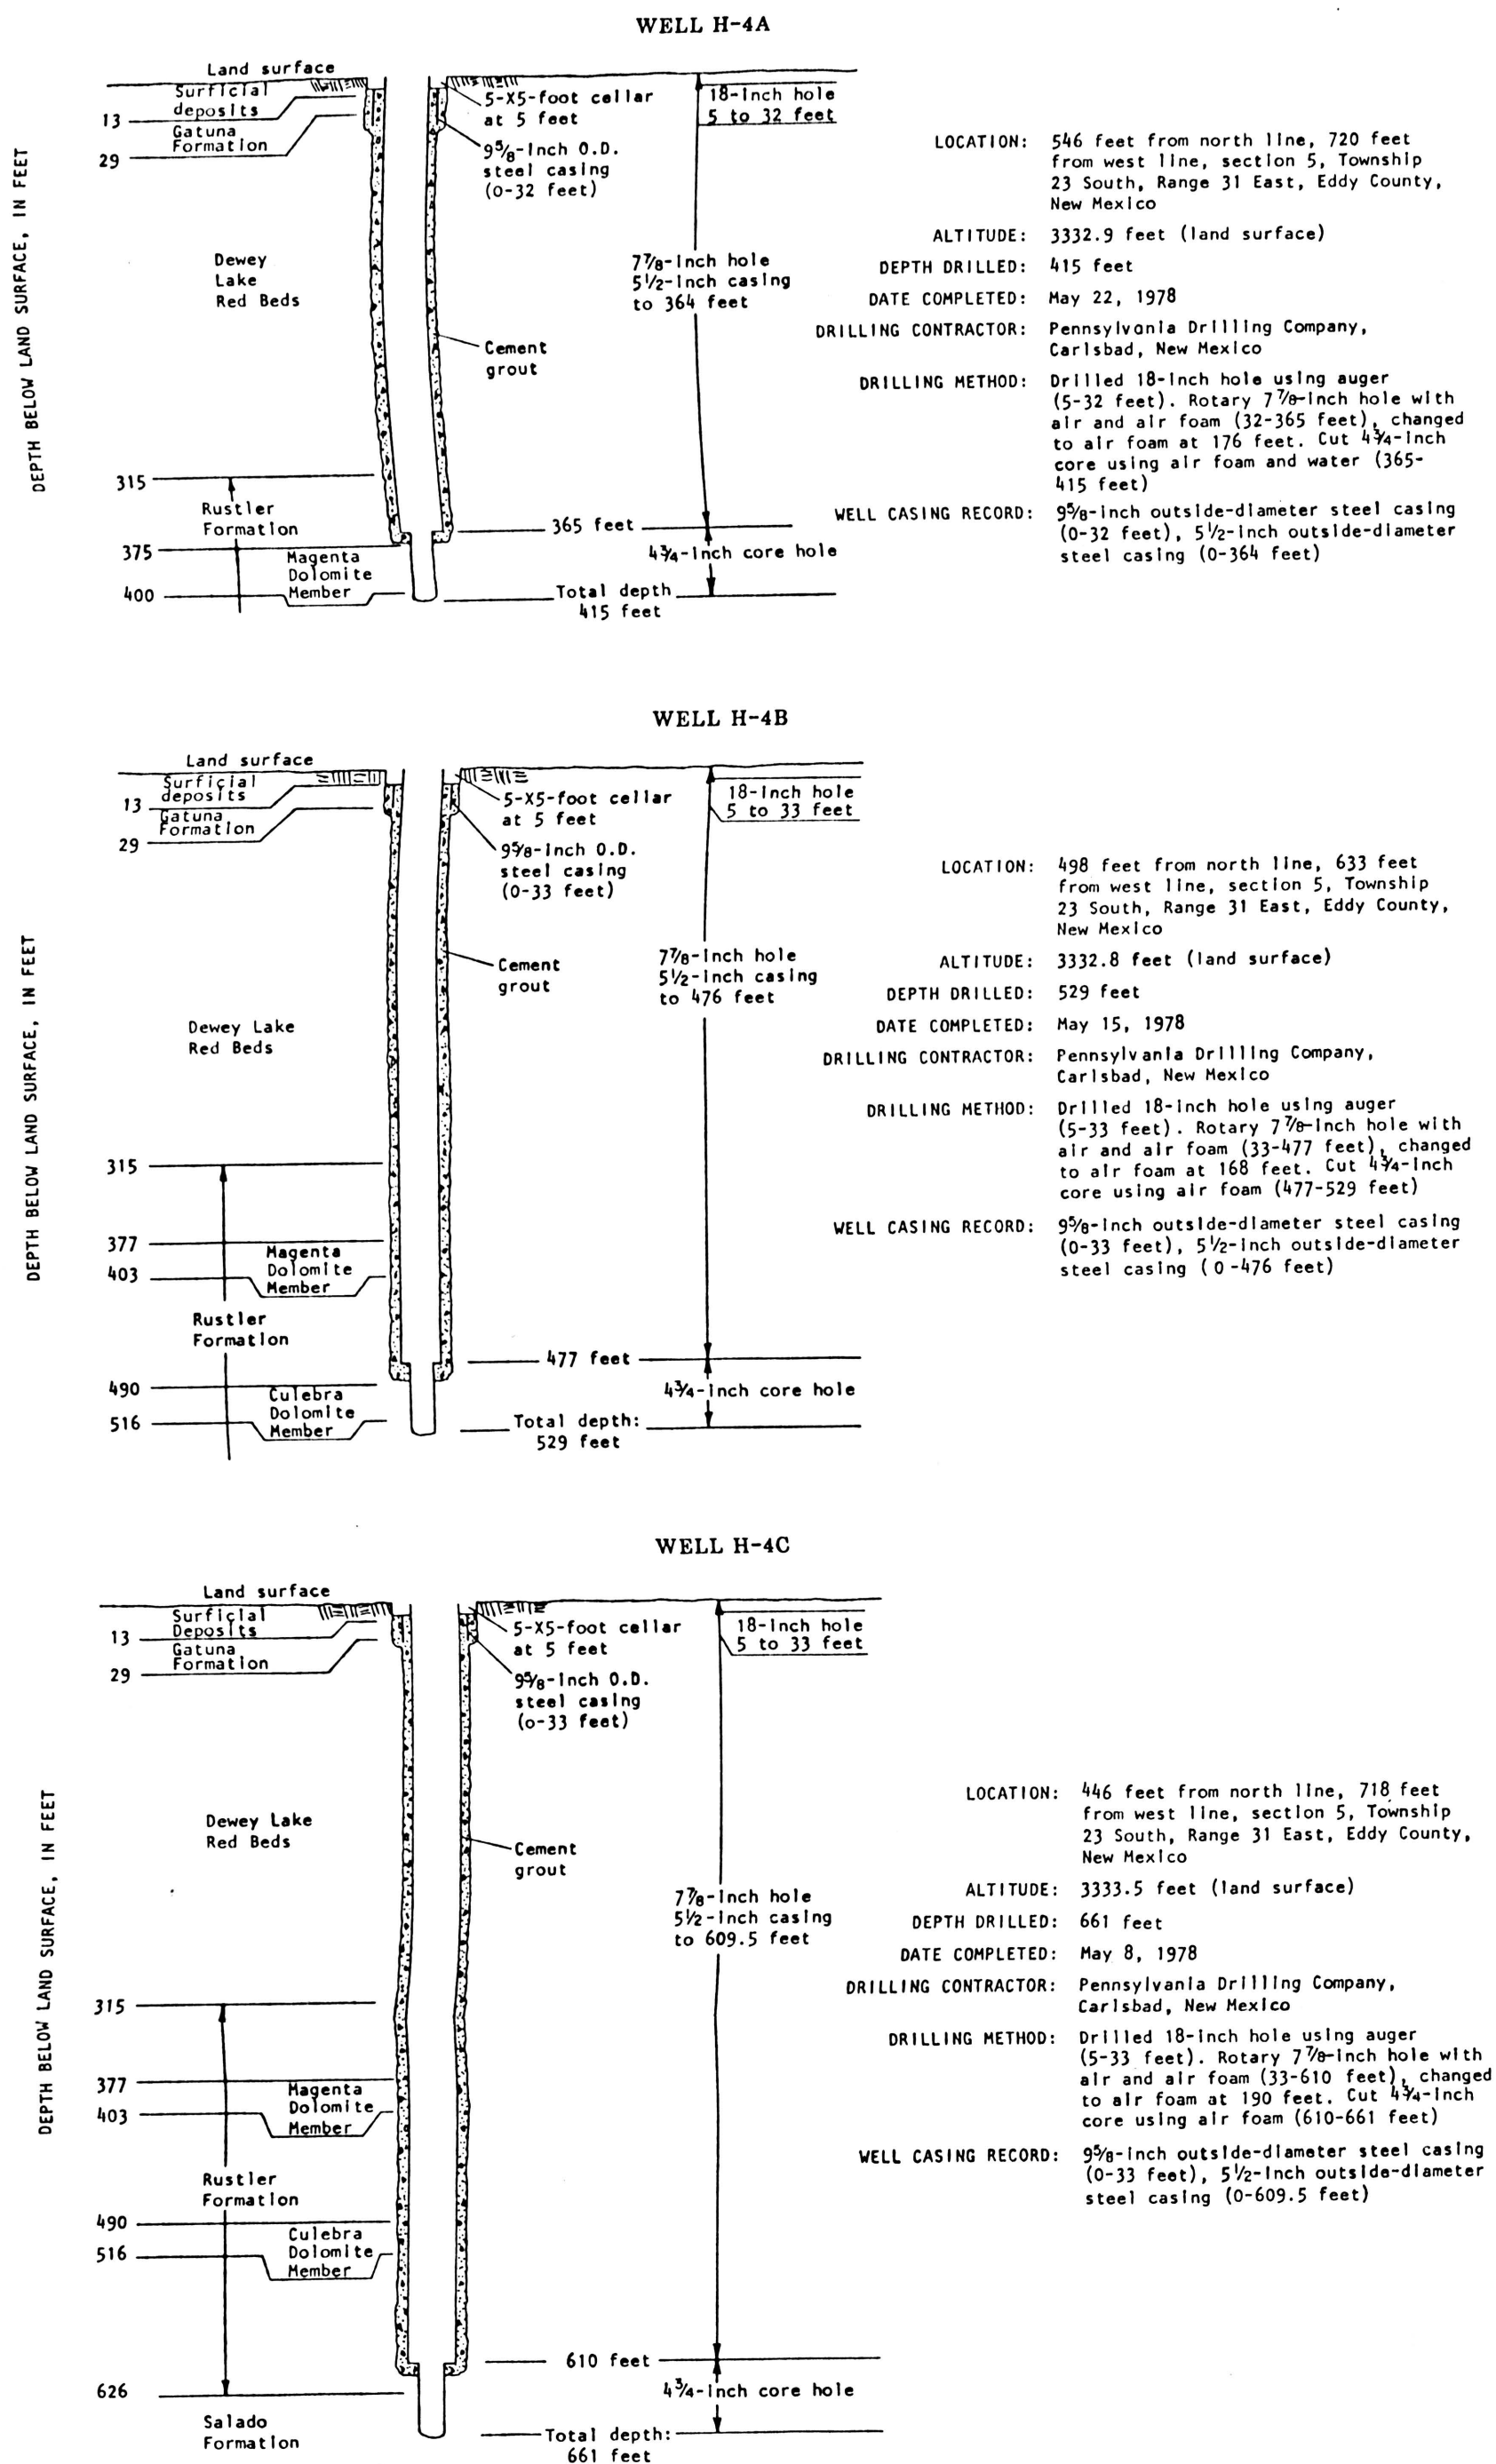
Construction detail of wells H-4A, H-4B, and H-4C.
